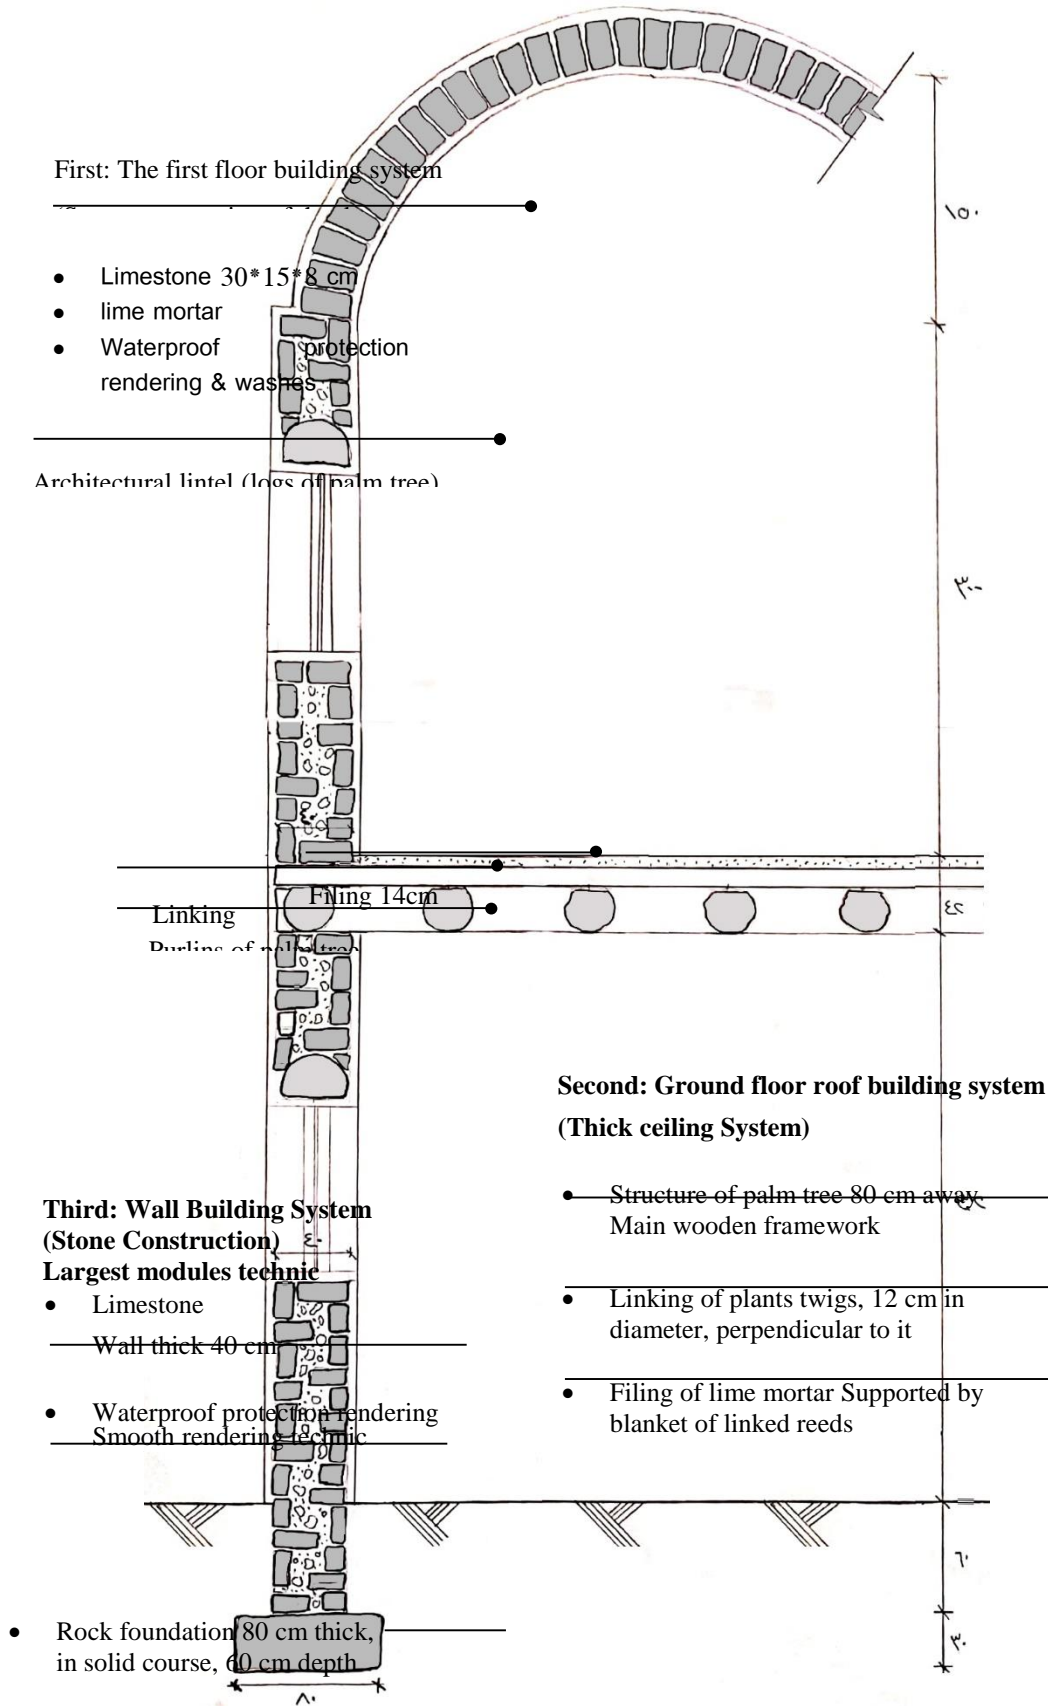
Section in tourist village chalet, in North Sinai, explaining the use of raw surrounding environment materials and traditional building systems, inspired by the Arab rural Mediterranean building system.
